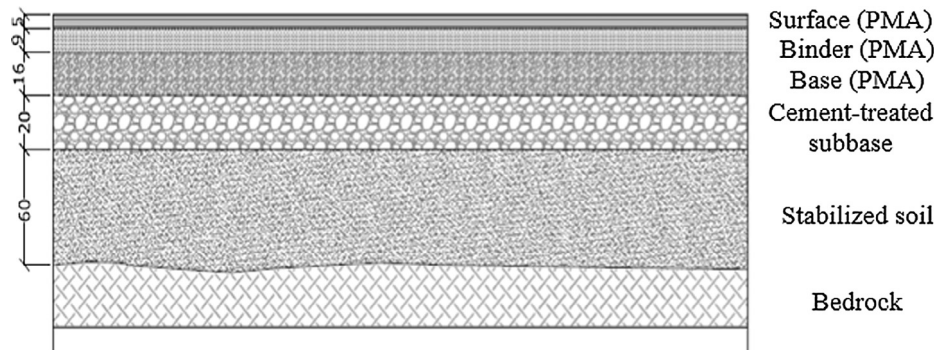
Scheme of the testing pavement at the Palermo International Airport.
